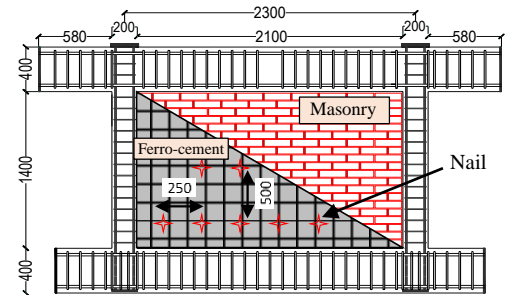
Geometry of masonry infilled RC frame (dimensions are in mm)
